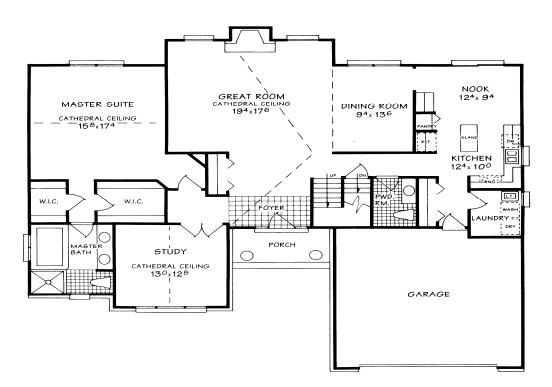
The Princeton Home, Floor Plan, 1st Floor
